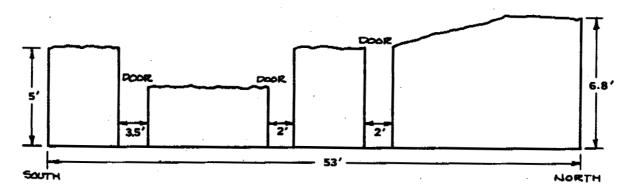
Elevation of Interior Wall Separating the Residential Rooms (Rooms 1, 3, and 6) from the Foyer and Stable (Rooms 2 and 5) in Sand Springs Station
